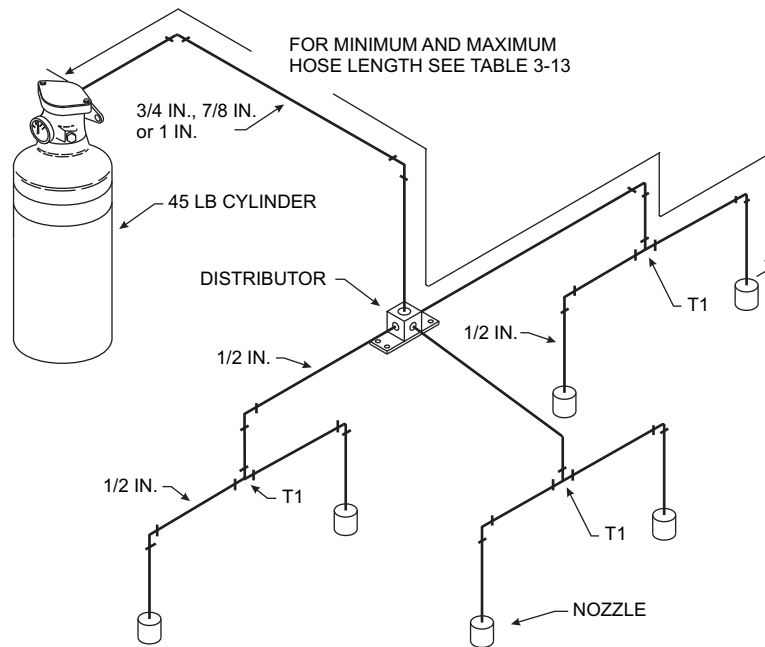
KVS-45 Six-Nozzle System Using a Distributor
